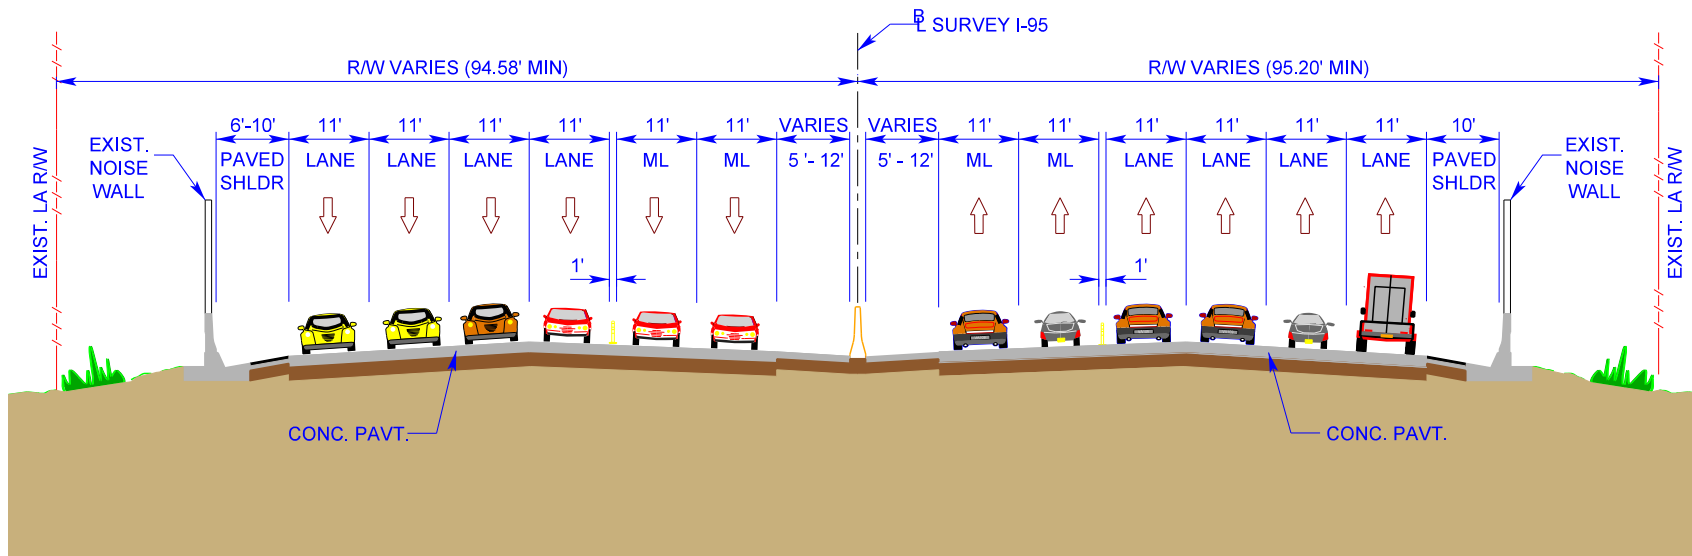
Existing Typical Section- I-95 South of Golden Glades Interchange
